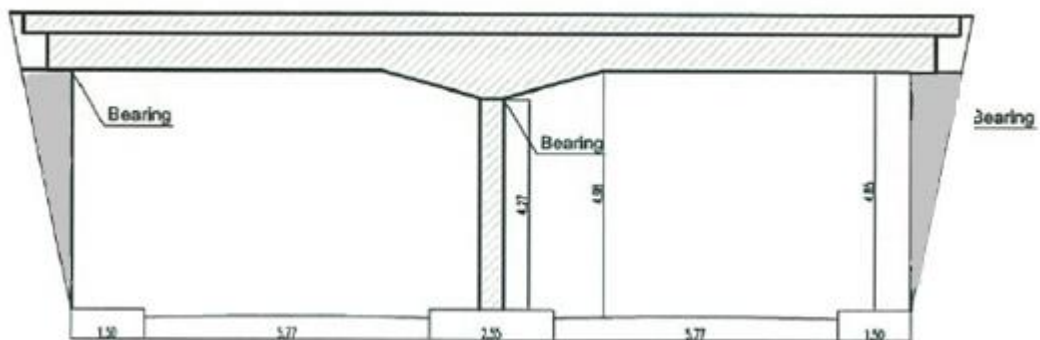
Disposition of abutments of bridge (gray) (section 4-4)
